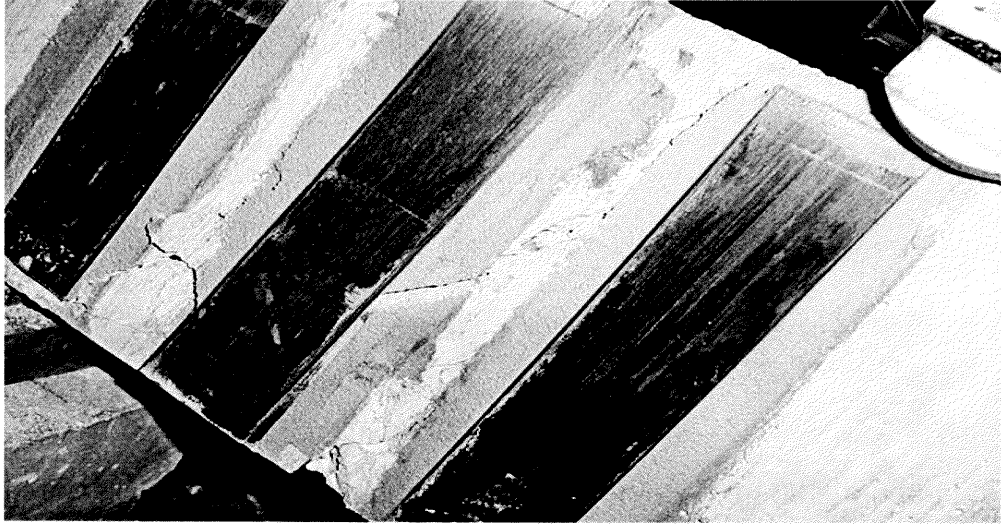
Failure of beam 2-3 with 90 degree aligned CFRP at left support
